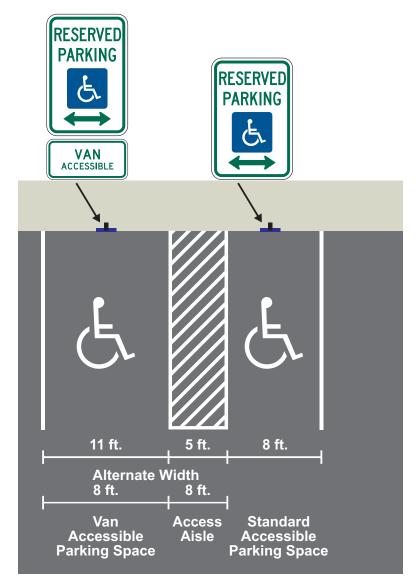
shows additional design considerations relating to off-street parking facilities.
